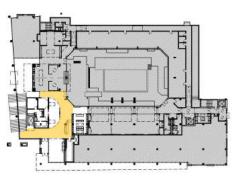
| Level 1 Floor Plan - Main Lobby + Concierge Desk
